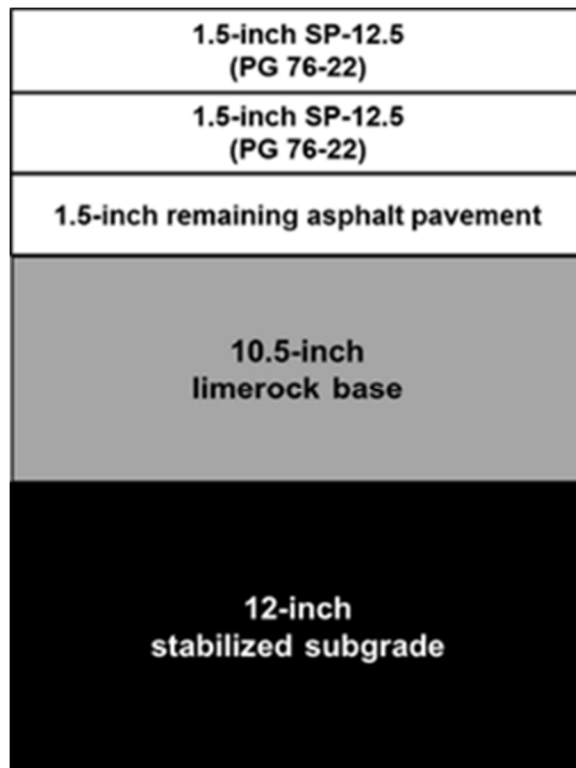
Pavement cross section for lanes 3, 4, and 5. Not to scale.
